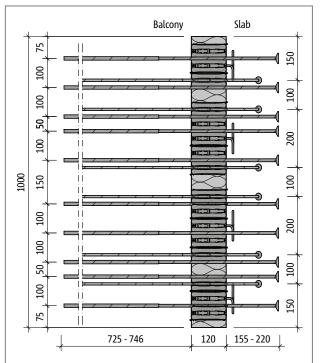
Schöck Isokorb® XT type K-U-M4: Product plan view
